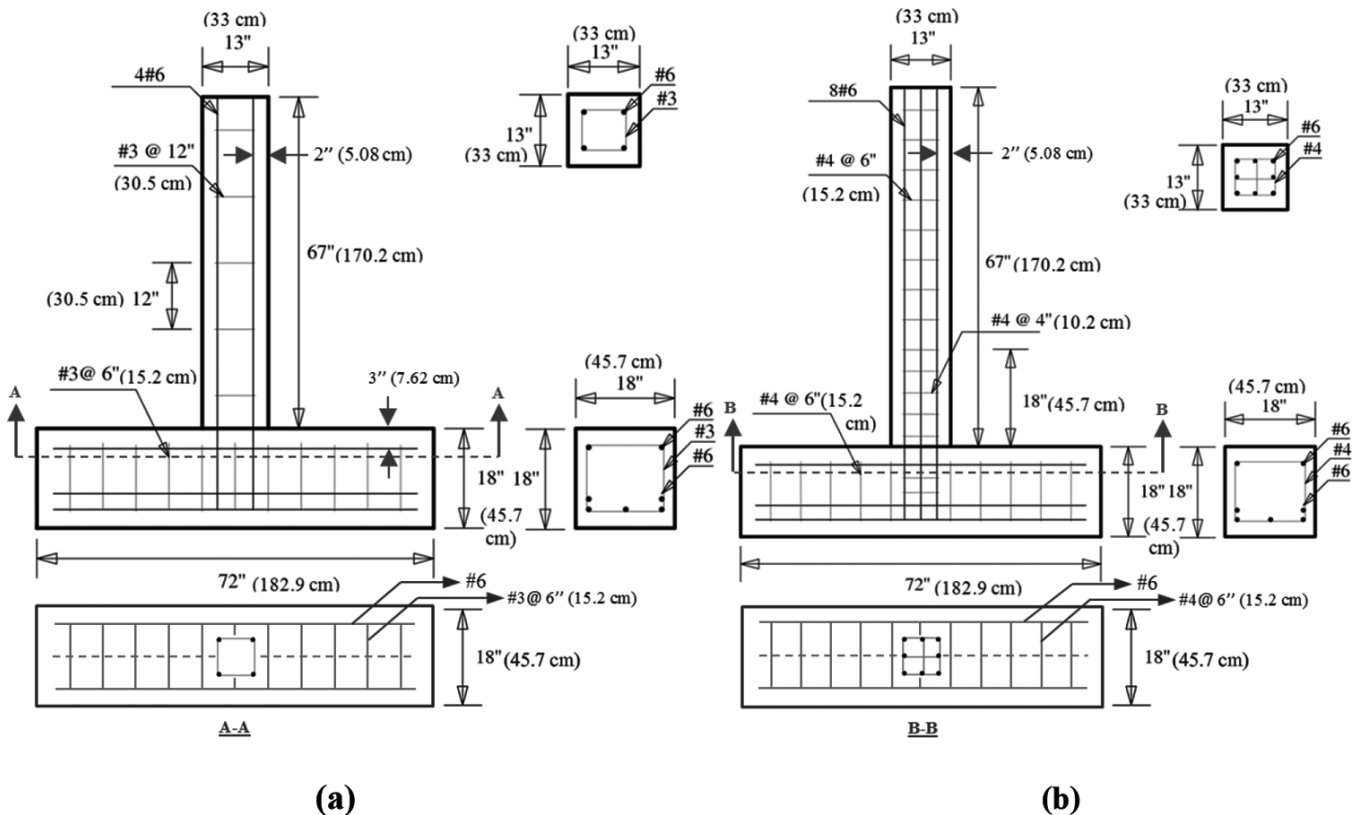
Cantilever RC column specimens: (a) Specimens No. 1 and 3; and (b) Specimens No. 2 and 4.
